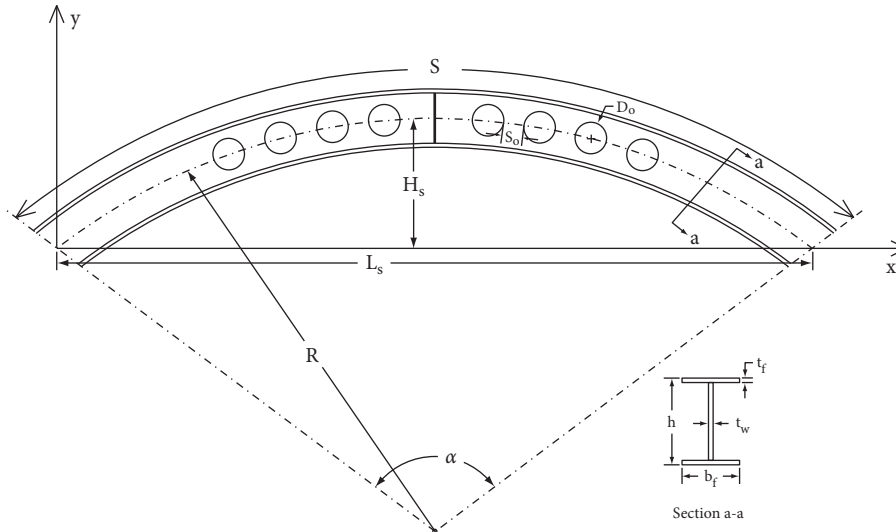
The geometry and the cross-sectional dimension of the test model.
